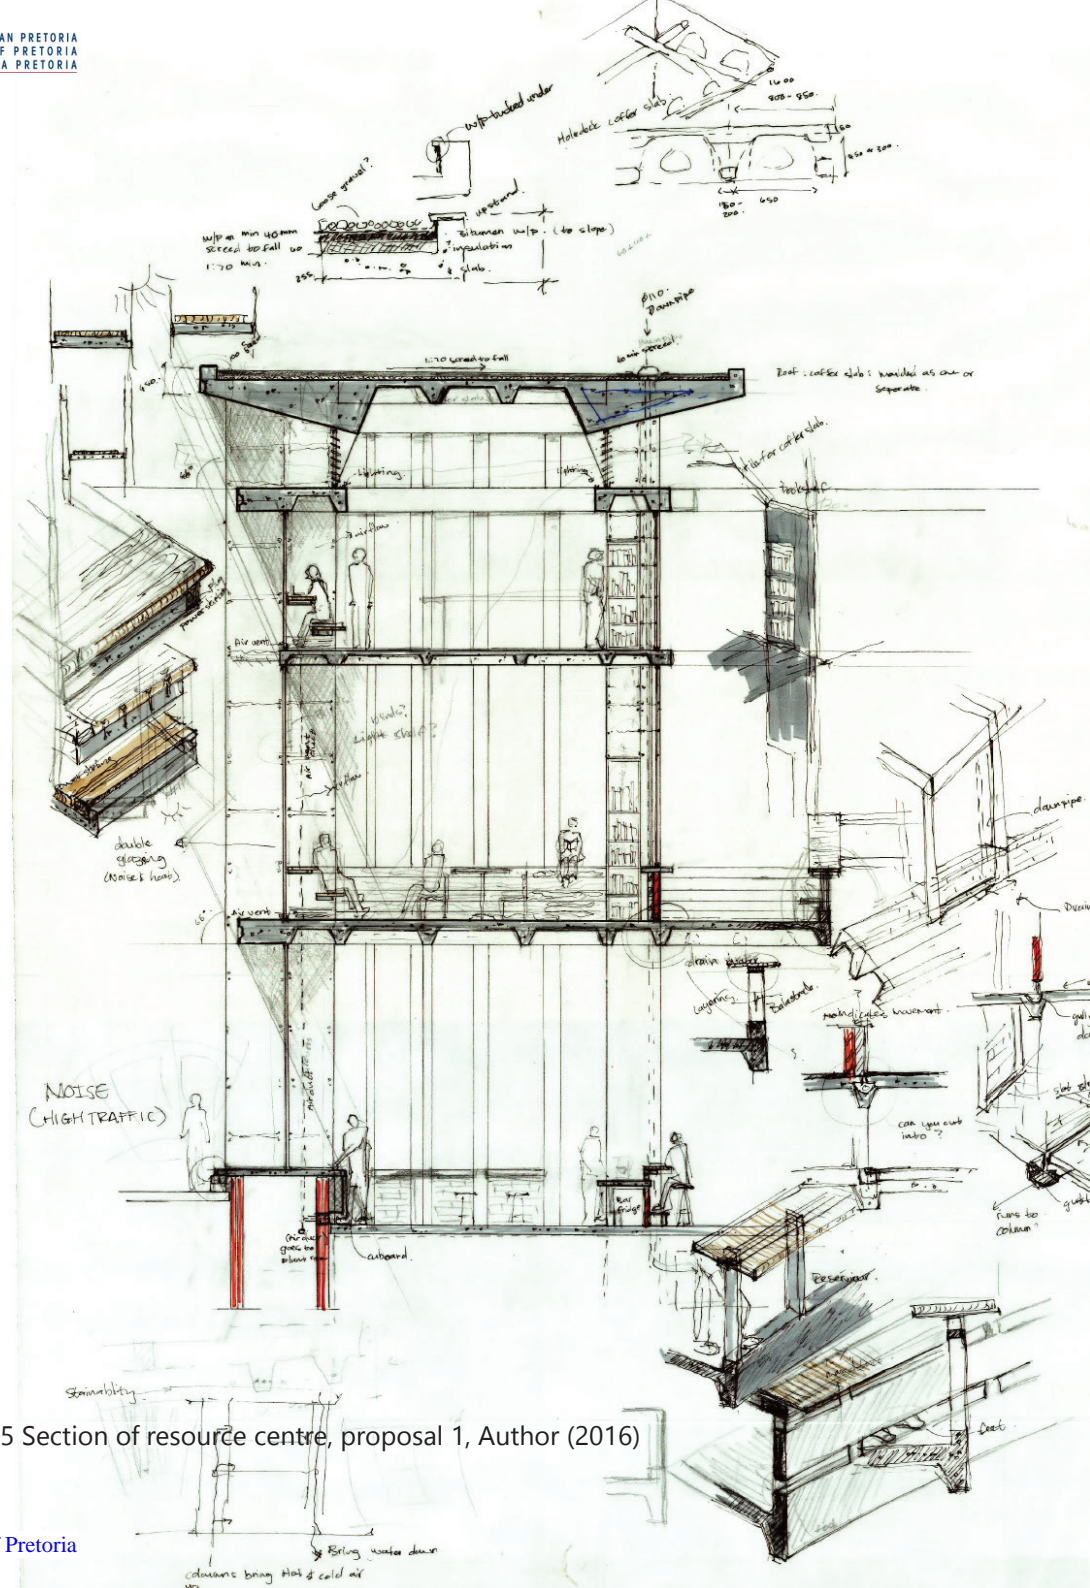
Section of resource centre, proposal 1, Author (2016)
